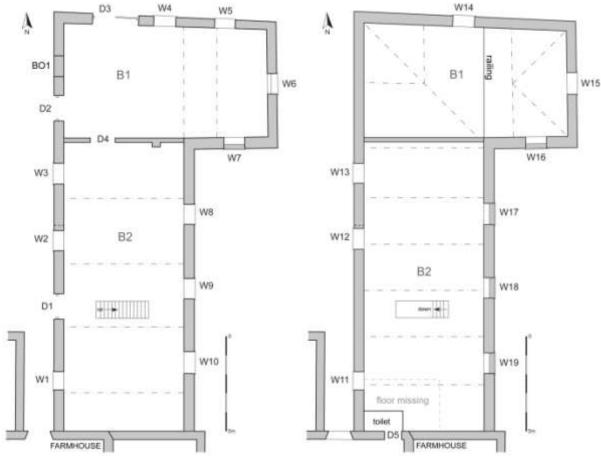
GROUND- (LEFT) AND FIRST-FLOOR (RIGHT) PLANS OF THE POUND HOUSE (B1) AND SHIPPON (B2) (BASED ON SUPPLIED DRAWINGS).
